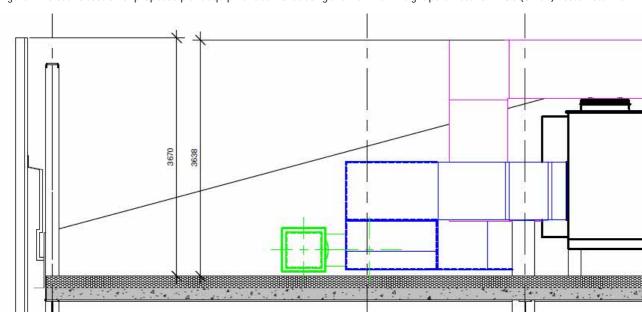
Indicative section of proposed plant equipment demonstrating the maximum height parameter on M&S (Unit 9) Fosse Retail Park
